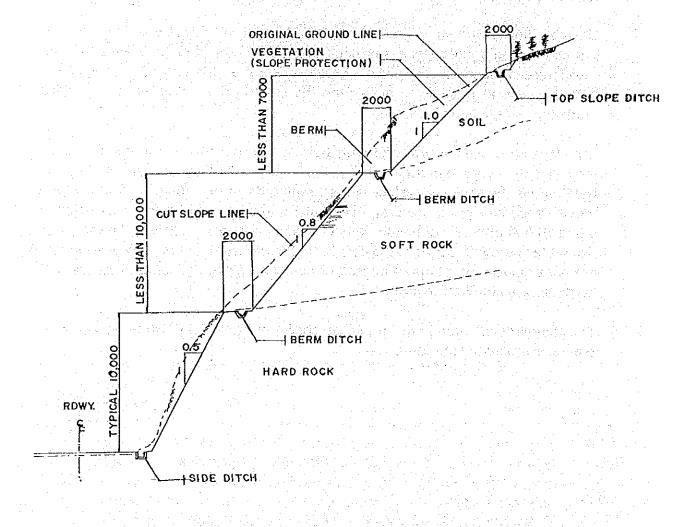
TYPICAL CROSS SECTION FOR CUT SLOPE
